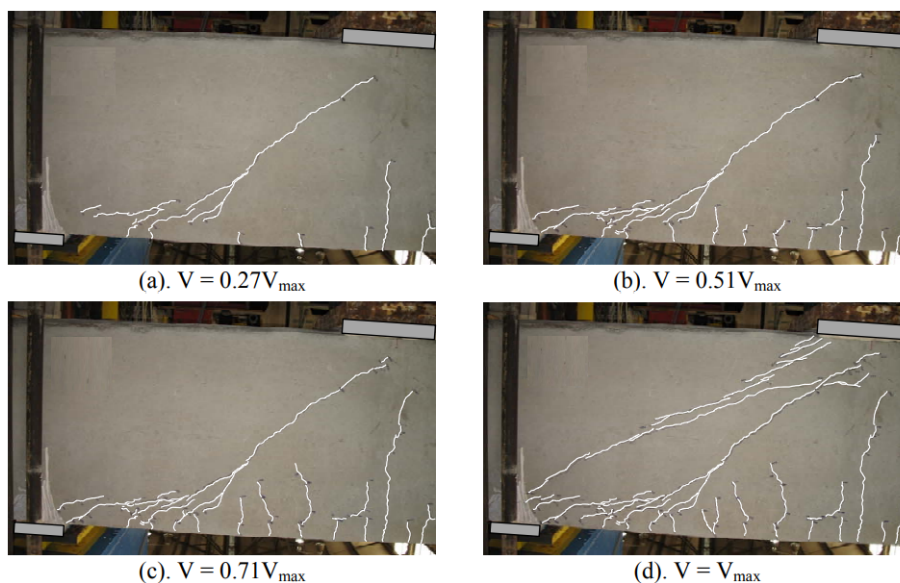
Crack development in specimen without web reinforcement, III-1.85-00 [3].
